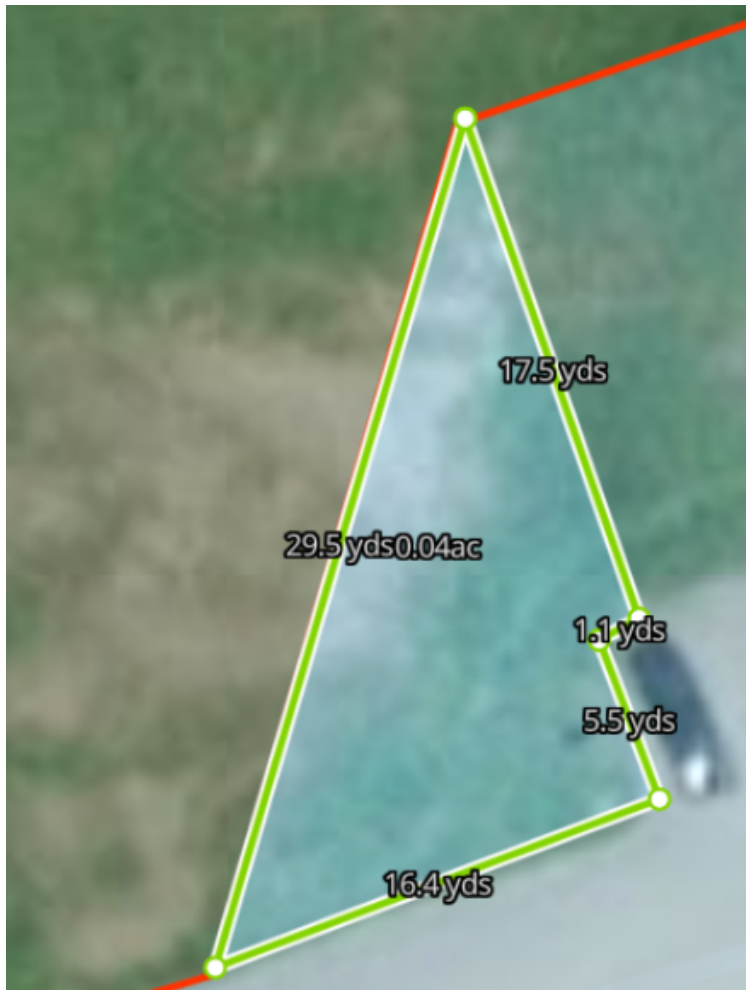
Proposed new parking area connector to existing exit drive detail dimensions
